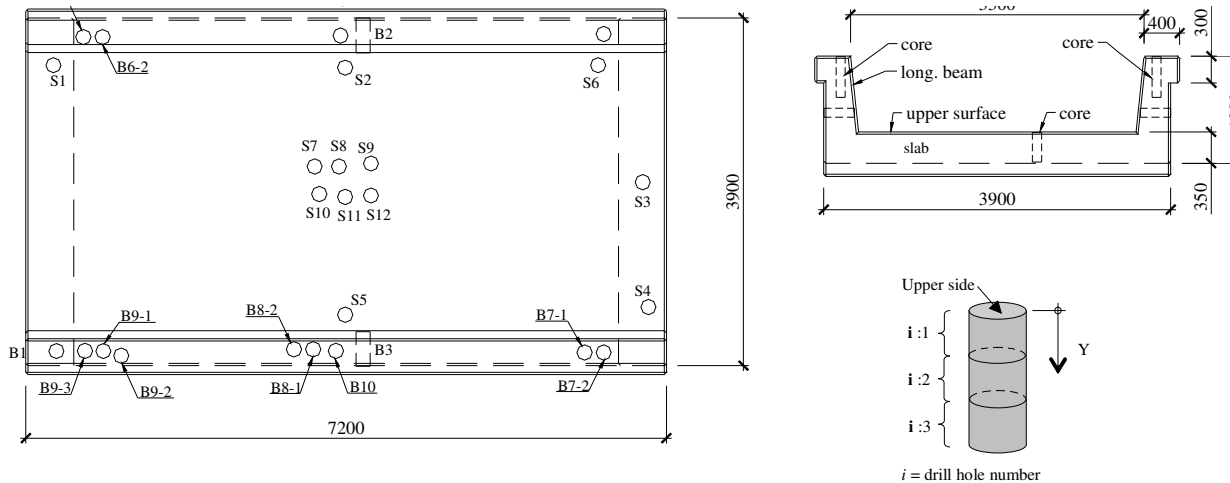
Dimensions and cross-section of the Lautajokki Bridge – a typical Swedish railway reinforced concrete trough bridge. The illustration also shows, in principle, where the cores have been obtained.
